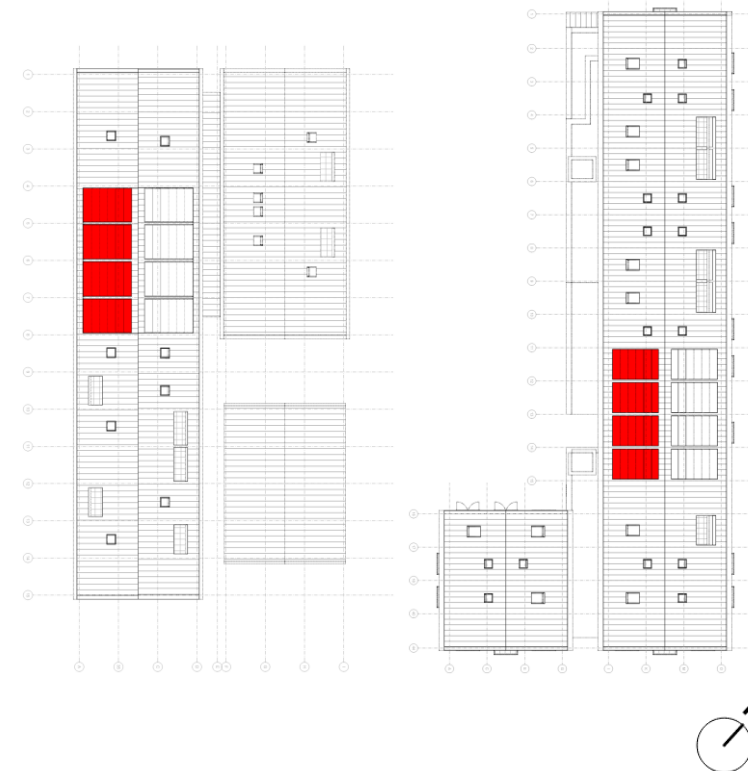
Roof plans of Wharf Lane (left) and Water Lane (right) building showing south-west facing roof space available for PVs
